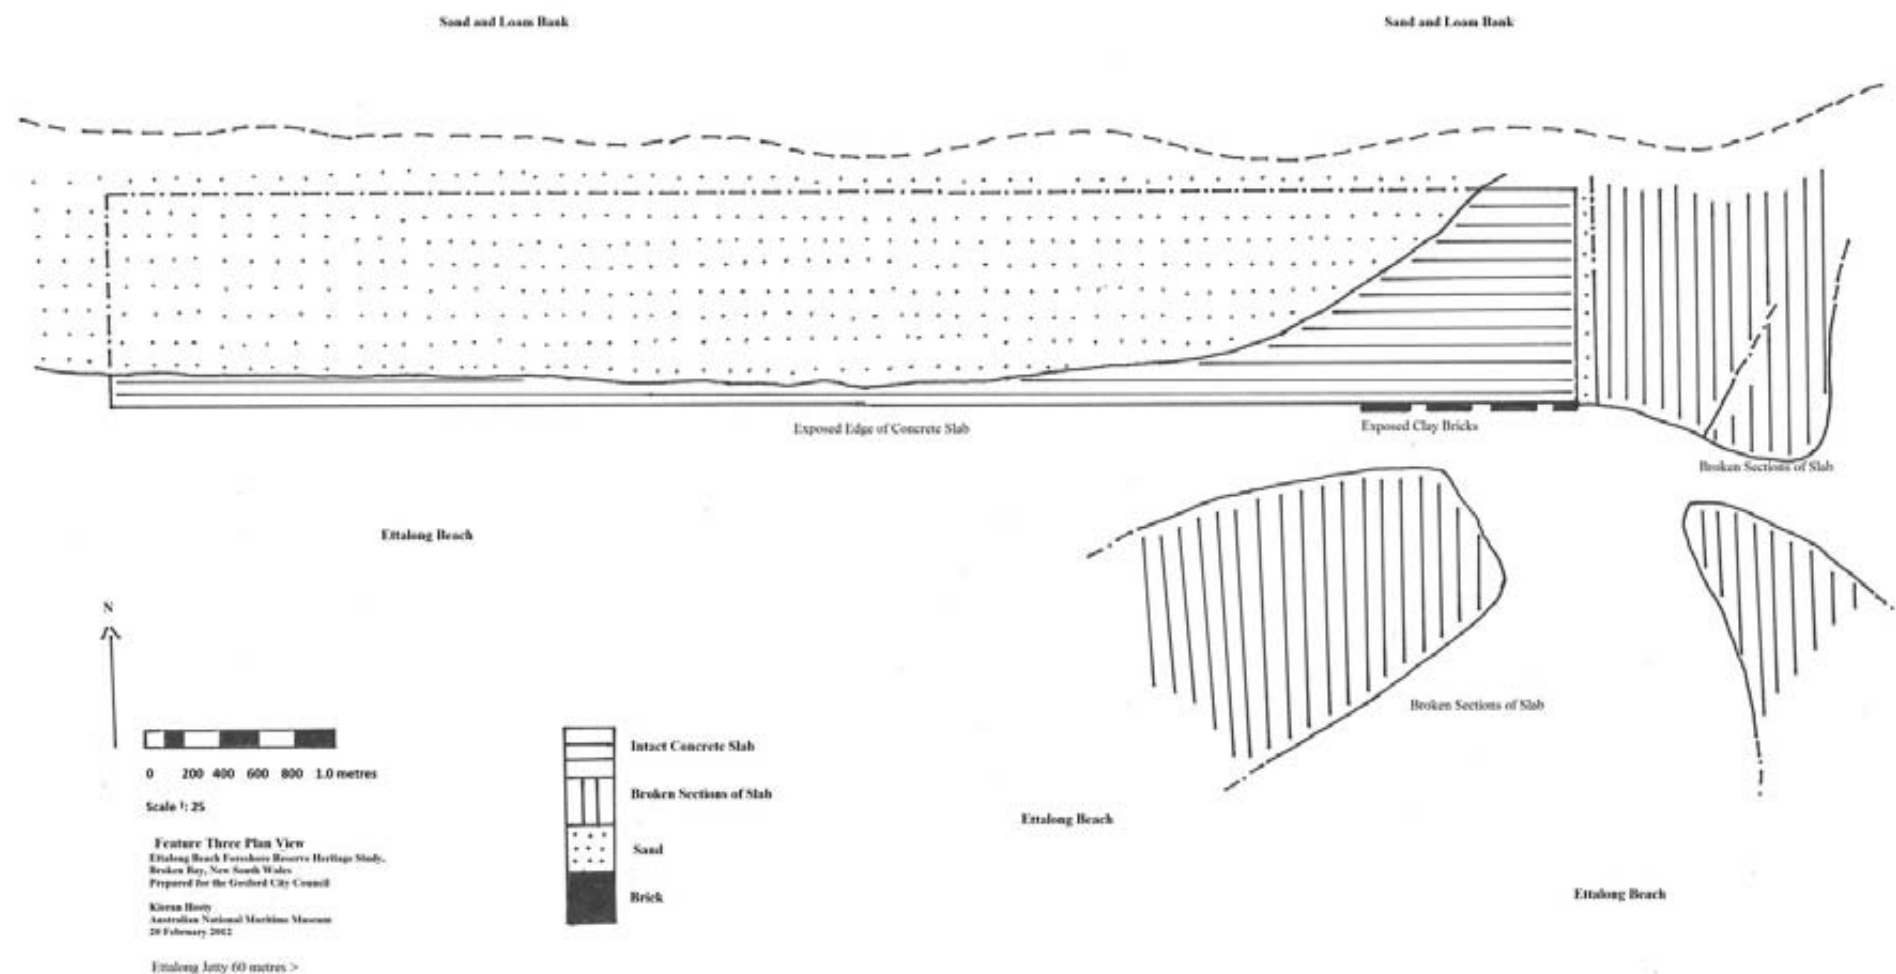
Sketch plan of Feature Three. (Source: ANMM 2012)
